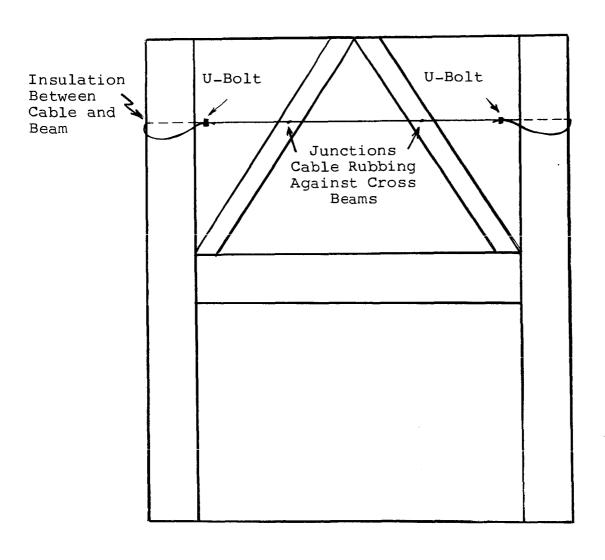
CABLE ARRANGEMENT ON UMBILICAL TOWER
